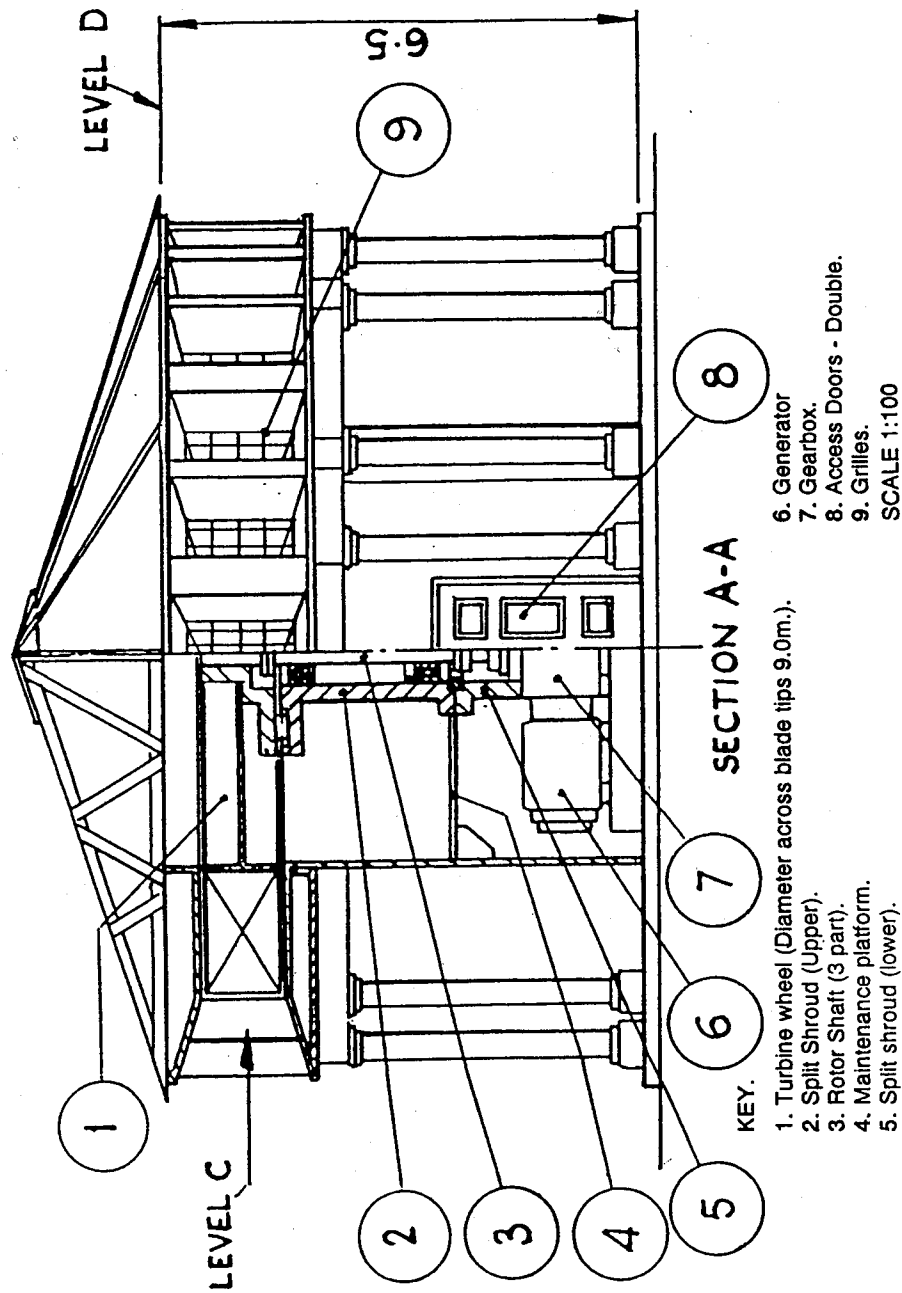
Wind Generator - Scheme B, Elevation & Section A - A. (All dimensions in metres). Copyright © K.M.Davies 1-1-92.
